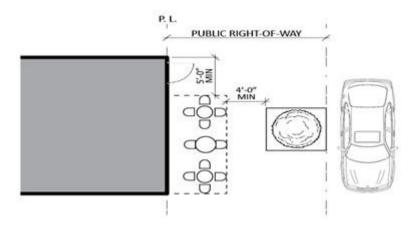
Example of an outdoor dining area in the public right-of-wayabutting a storefront wall without a barrier.
